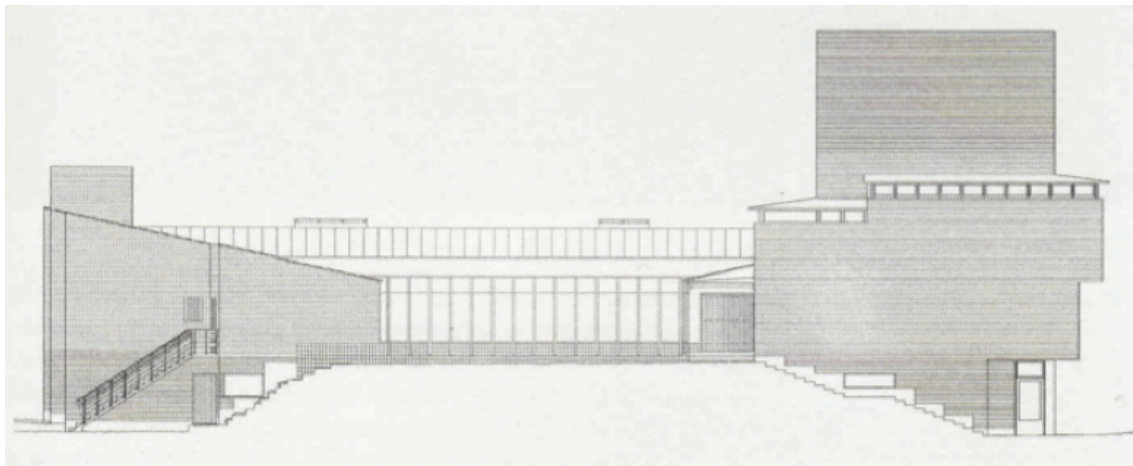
AALTO Säynatsälo Town Hall, section, showing stairs
